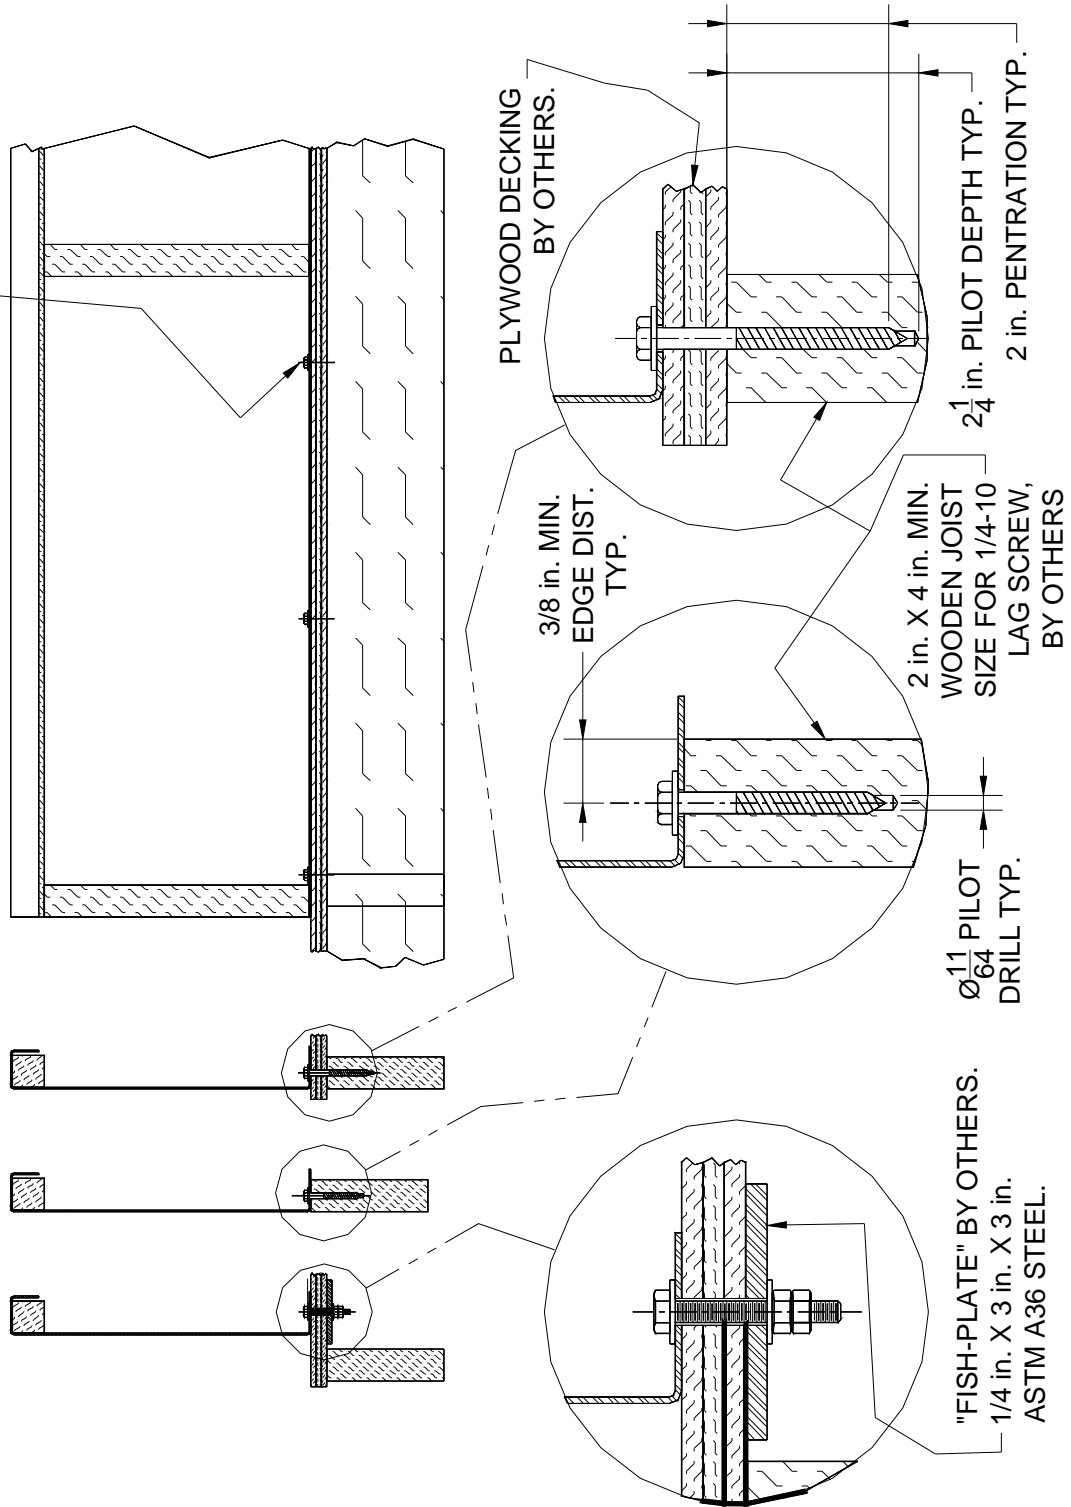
Attachment to Wood Using Through Bolts & Lag Screws.
